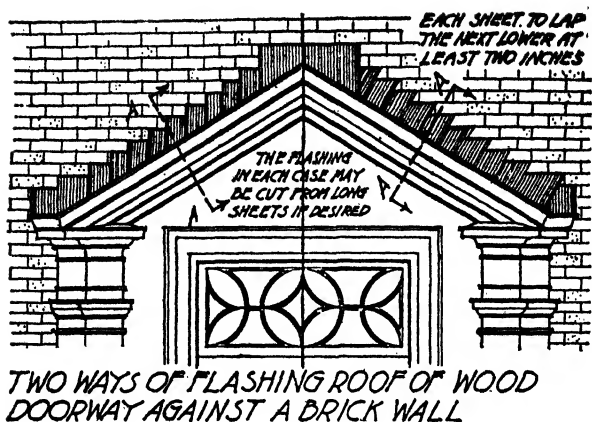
Flashings should be used where applied wood detail joins brickwork. Typical methods recommended over doorway.
